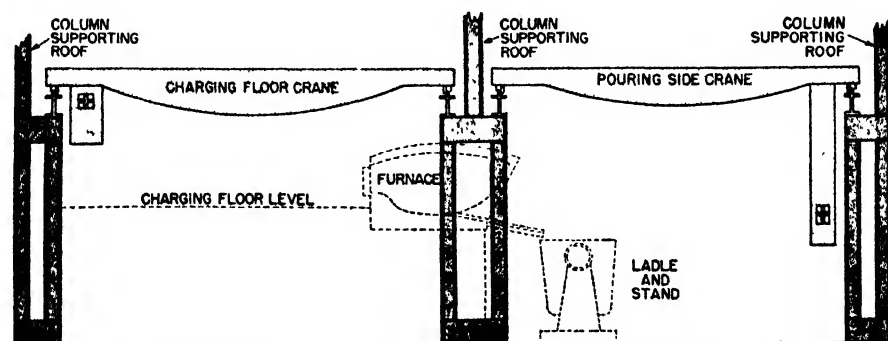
Arrangement of the columns supporting the roof trusses and crane runways of a modern open-hearth furnace building.
